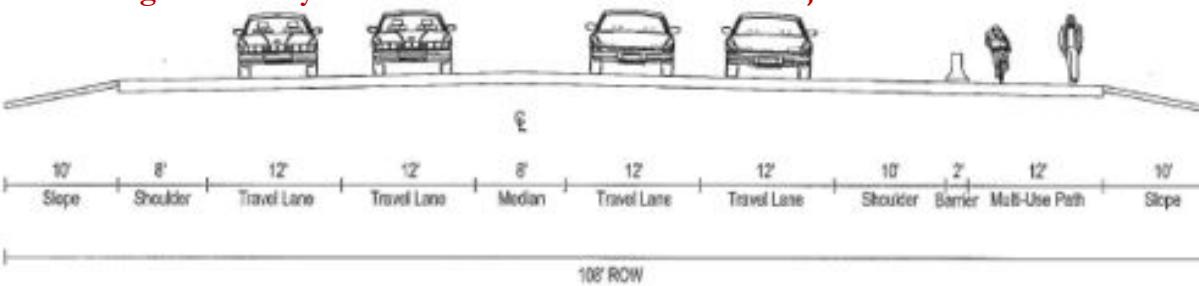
Recommended Corridor Plan: Huston Road to Ellmaker
